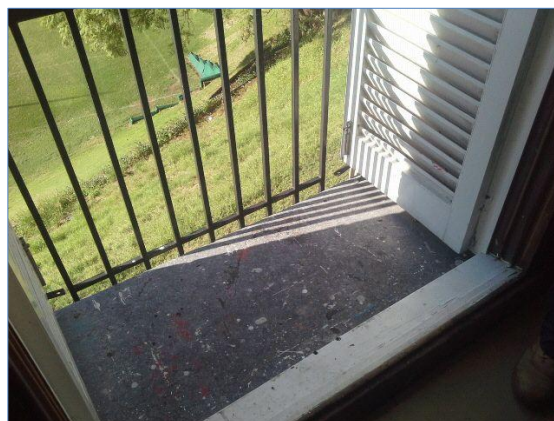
Studio 3 - 2.5 - Compressed asbestos cement bench in south east corner of room
